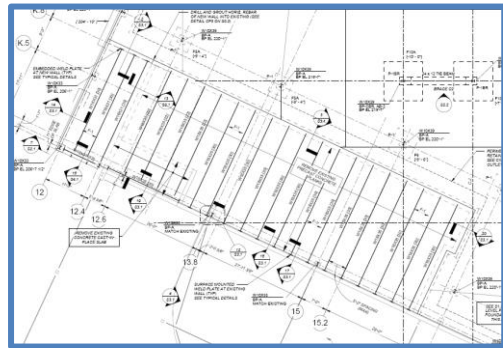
Structural Steel Layout at Kitchen Area of Existing Building
